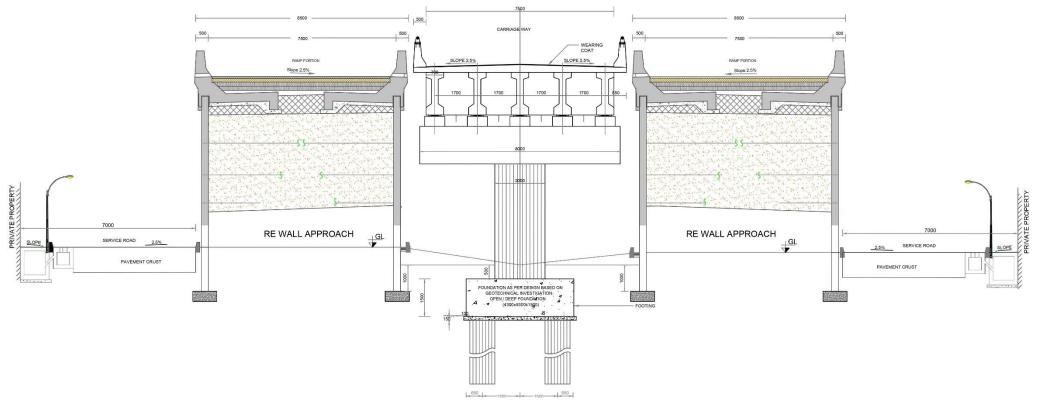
C Typical Cross Section of Approaches from Rotary to New Terminal Station
